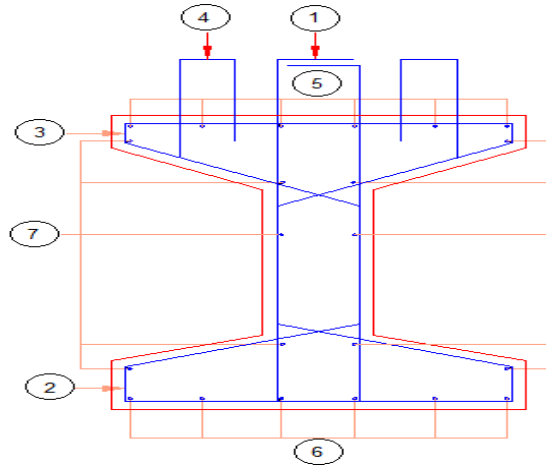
Details of girder's non-prestressing reinforcement as referred to in Table 5.2.
